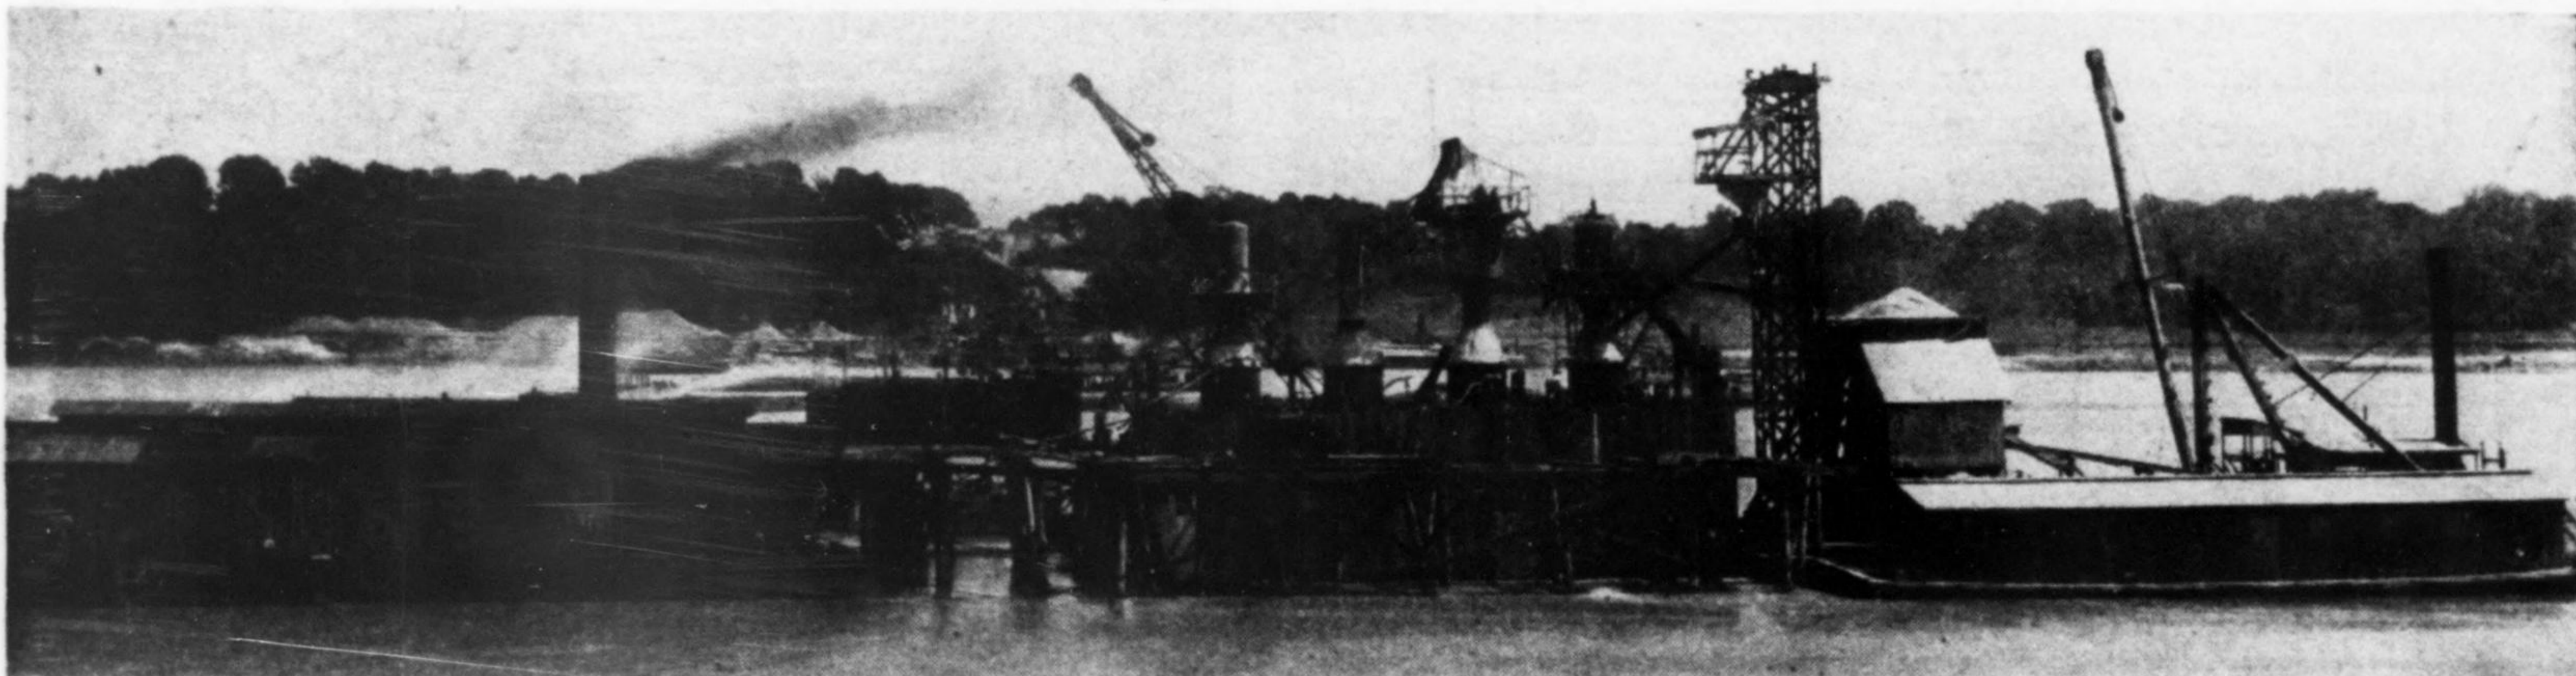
SINKING CAISSON FOR PIER 6, VICKSBURG BRIDGE
